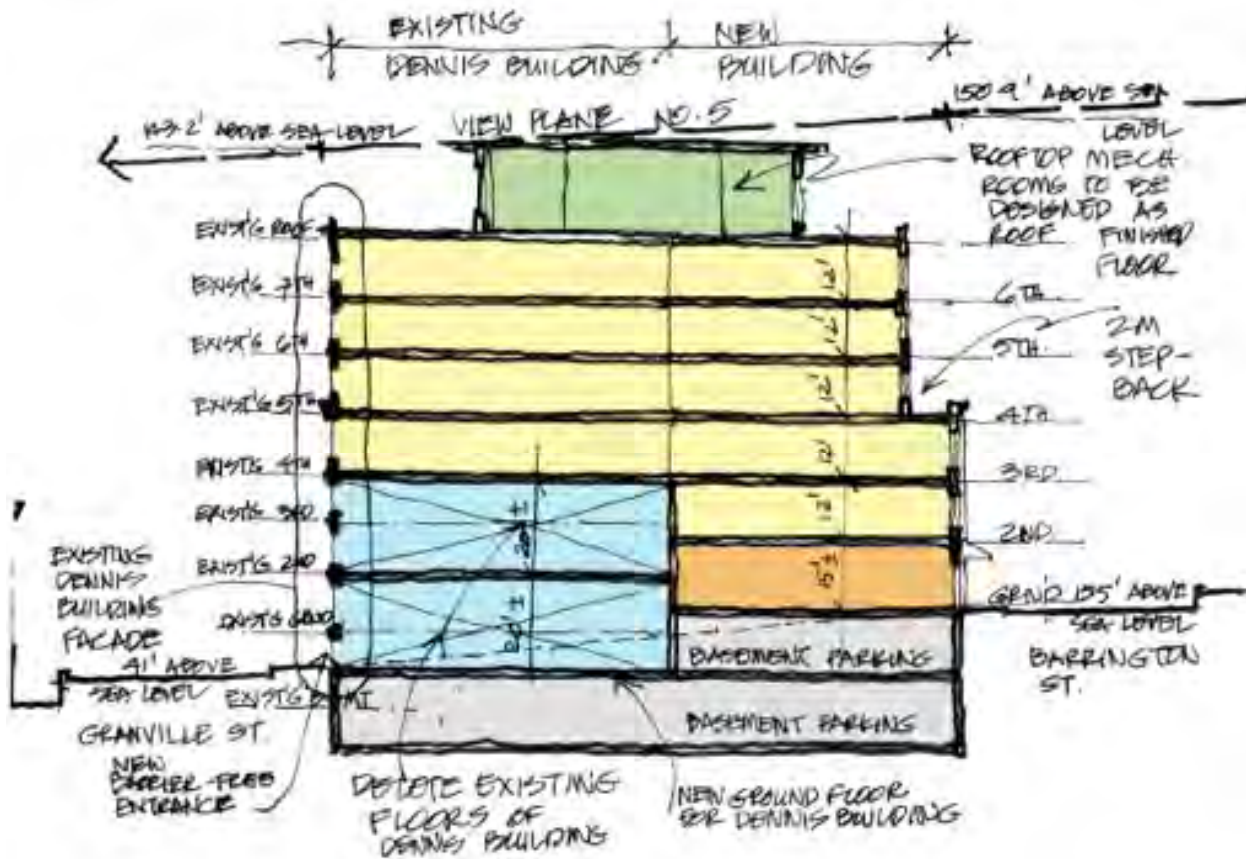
Possible floor configuration of new structure behind Dennis Buildings facade
